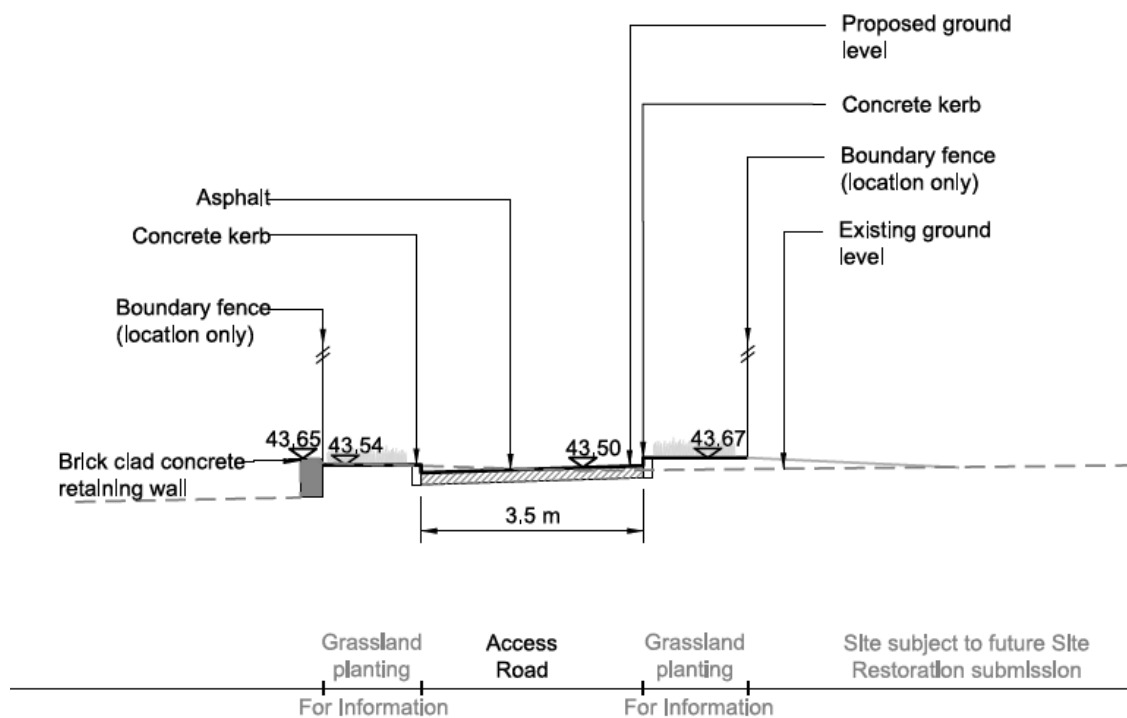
Access road earthworks section looking north east from South Ruislip Vent Shaft compound towards access gate
